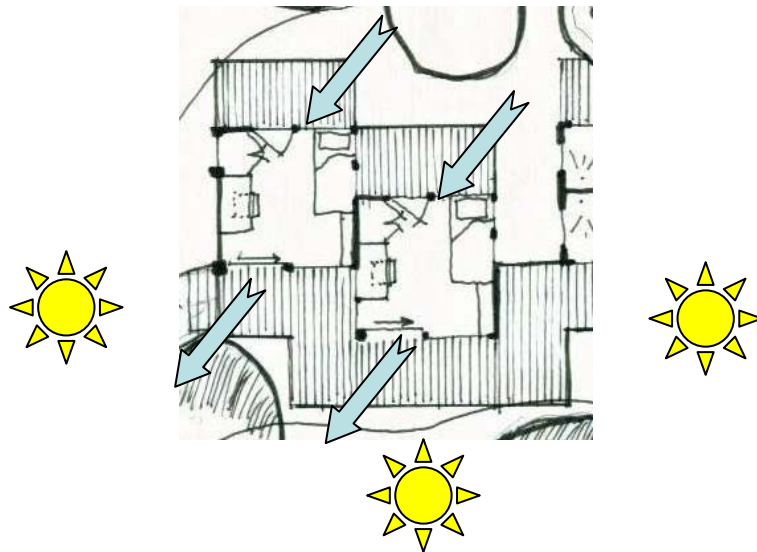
"Eyes on the Wetland" room layout, sun path and trade winds
